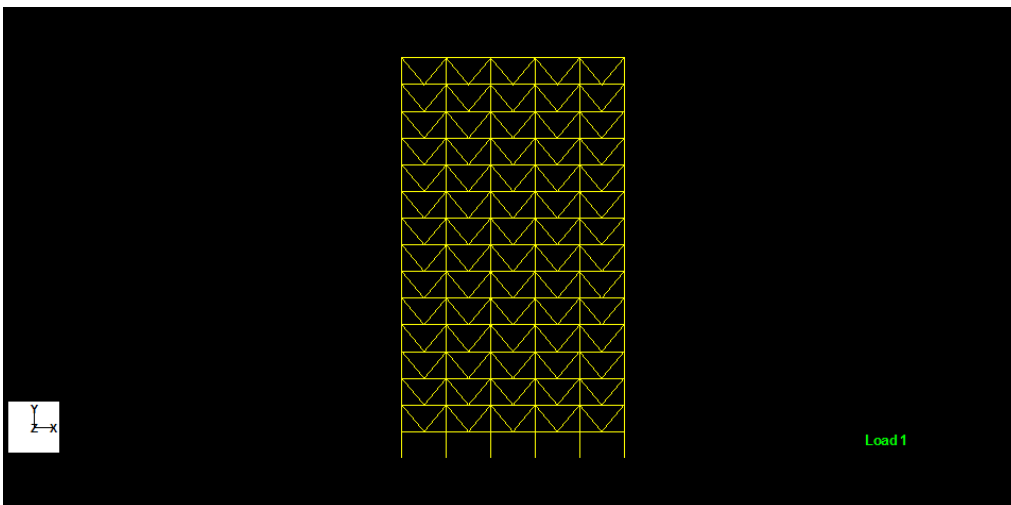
Elevation of Multi-Storeyed Building with V Bracings
